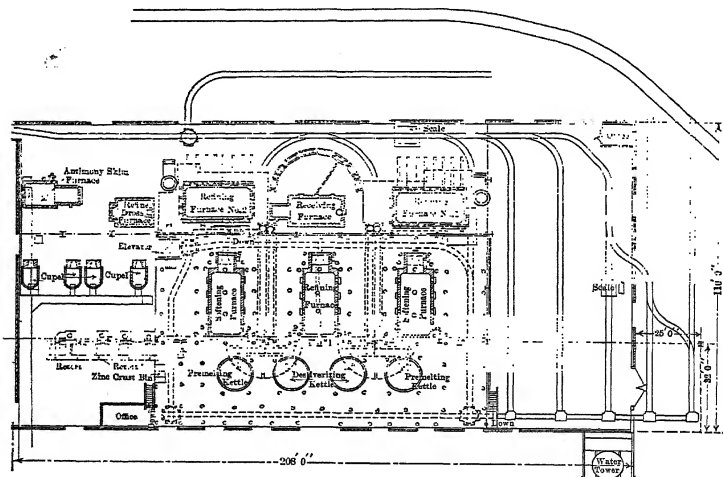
Horizontal section Parkes plant, Balbach Smelting and Refining Co., Newark, N. J.
